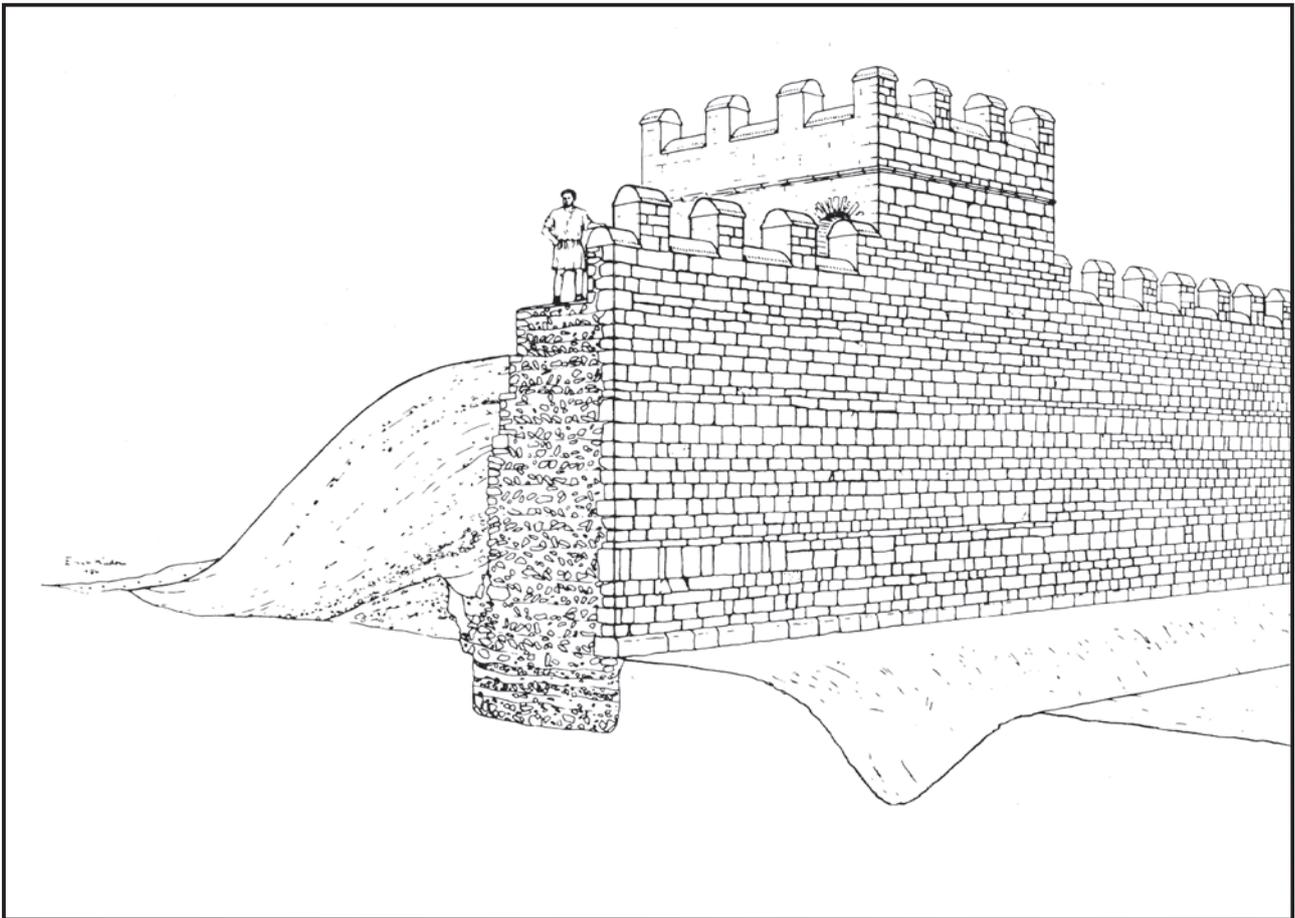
Reconstruction of the City Wall and internal tower at Paul Street (Site 76) as envisaged by Christopher Henderson and drawn by Erich Kadow (© Exeter City Council)
